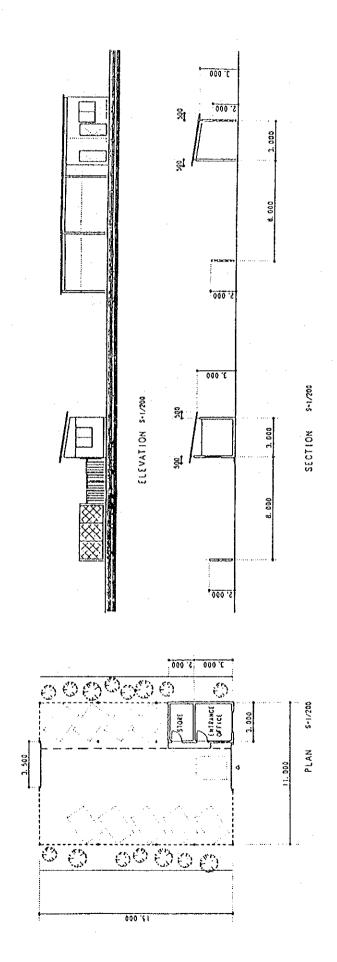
Amenity Center (Plan, Elevation, Section.)
